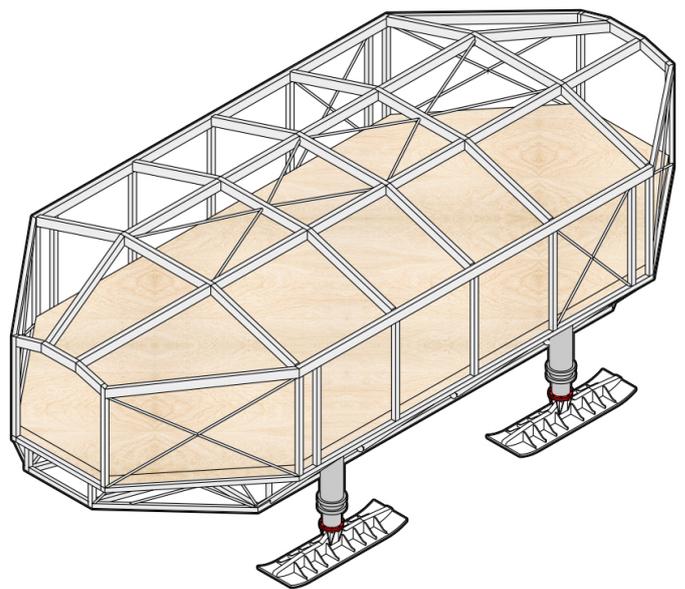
Module of structure construction- stage 4 steel Superstructure was installed on bottom frame. Original author
